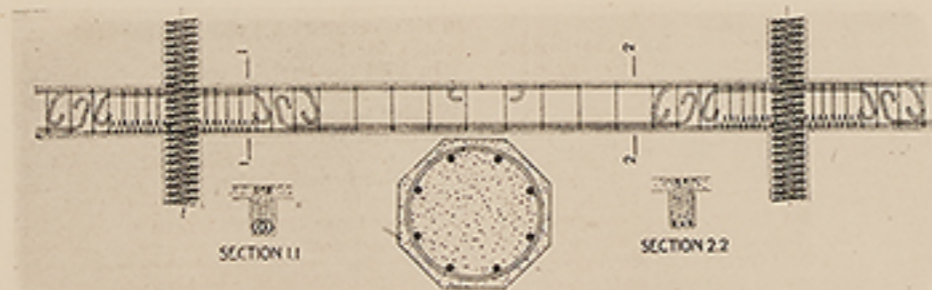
Considère System : Reinforcement in Columns and Continuous Beams.
